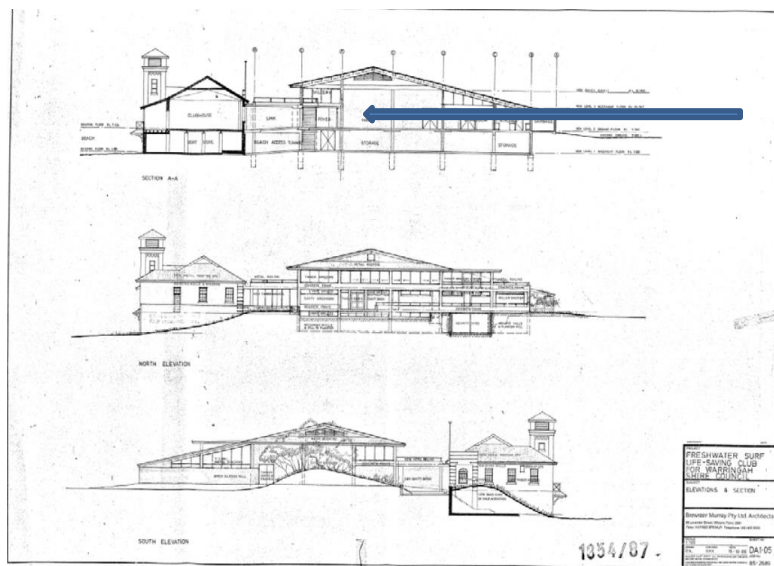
Plan showing the proposed additions to the Freshwater SLSC in 1987.
